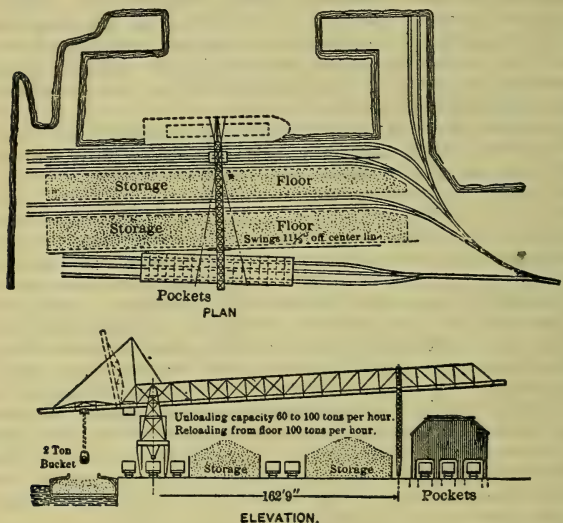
Travelling tramway storage and handling plant, Staples Coal Co., Fall River, Mass. Plan and elevation.
